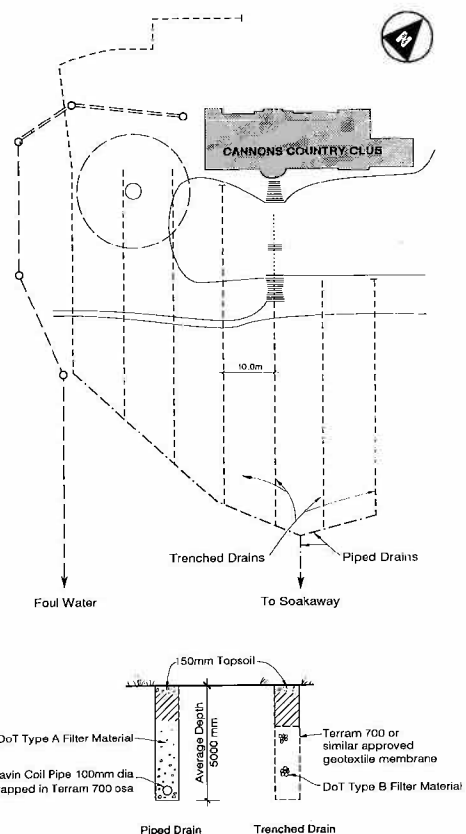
Plan of drainage installed in grounds with sections through drains and soakaways
